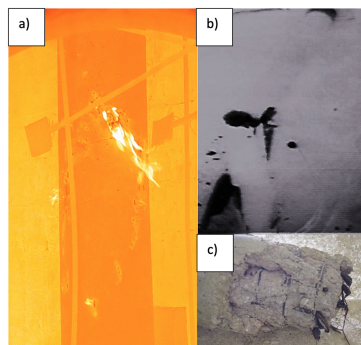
Fire resistance tests of a concrete column with BFRP internal reinforcement: a) flames coming outside of the specimen, b) failure mechanism; c) concrete column after the test
